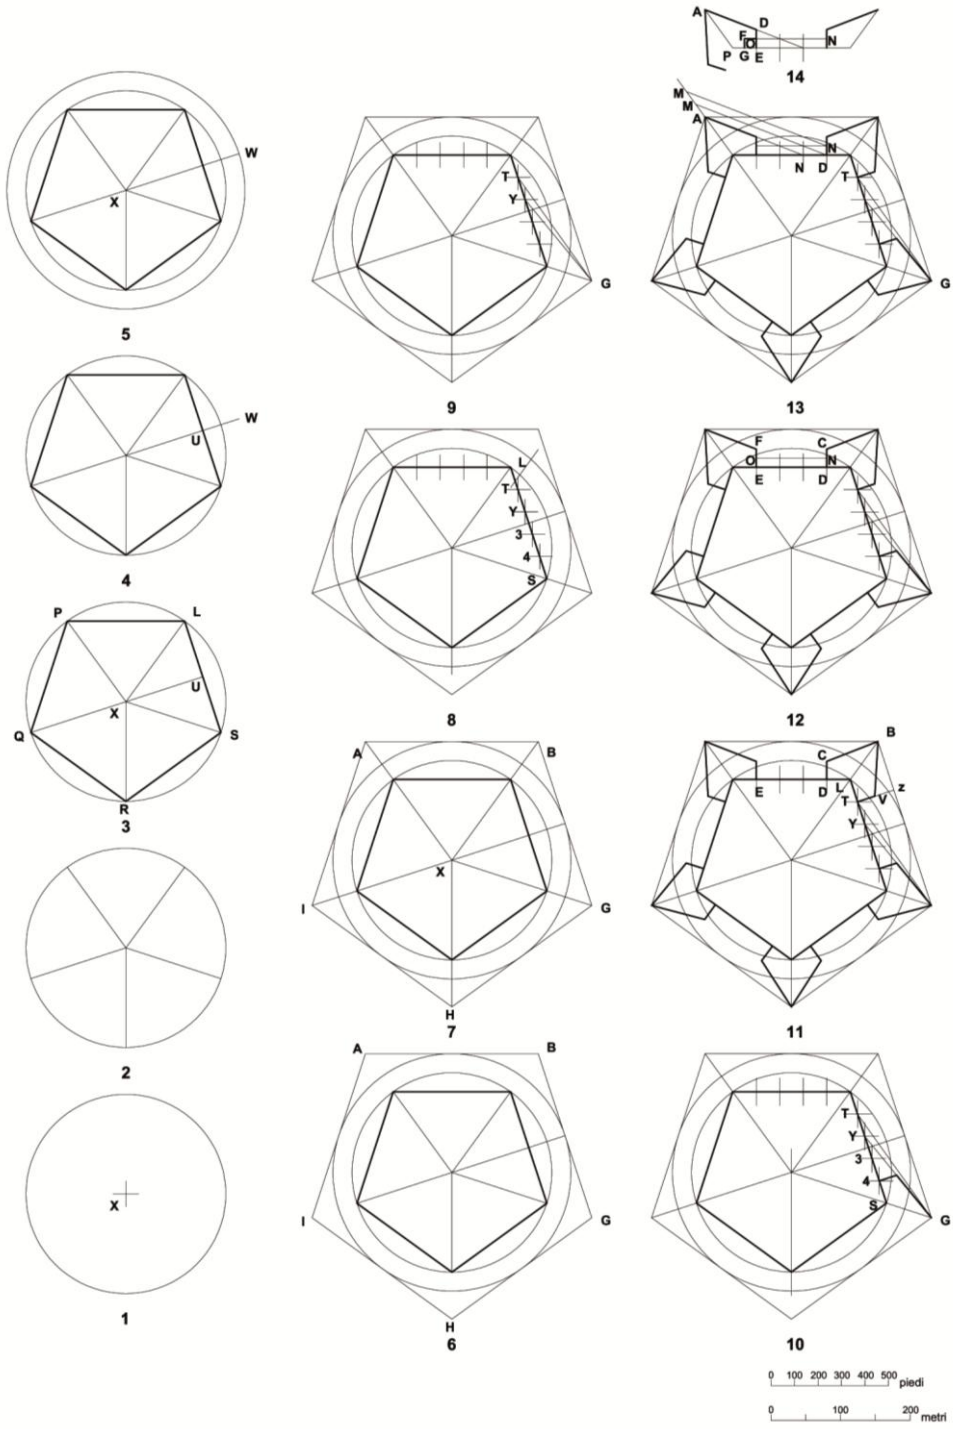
Geometrical sequence of the 'regular fortress' construction. (Drawing by Roberta Spallone).
